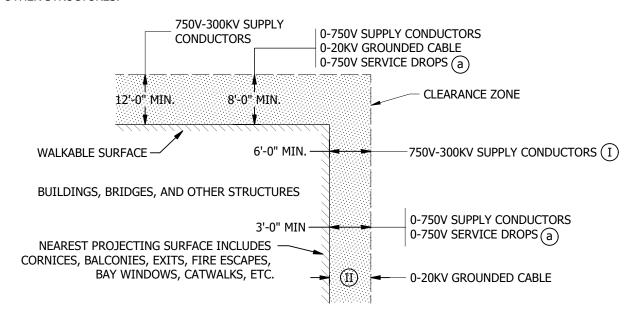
NEAR BUILDINGS, BRIDGES, AND OTHER STRUCTURES
